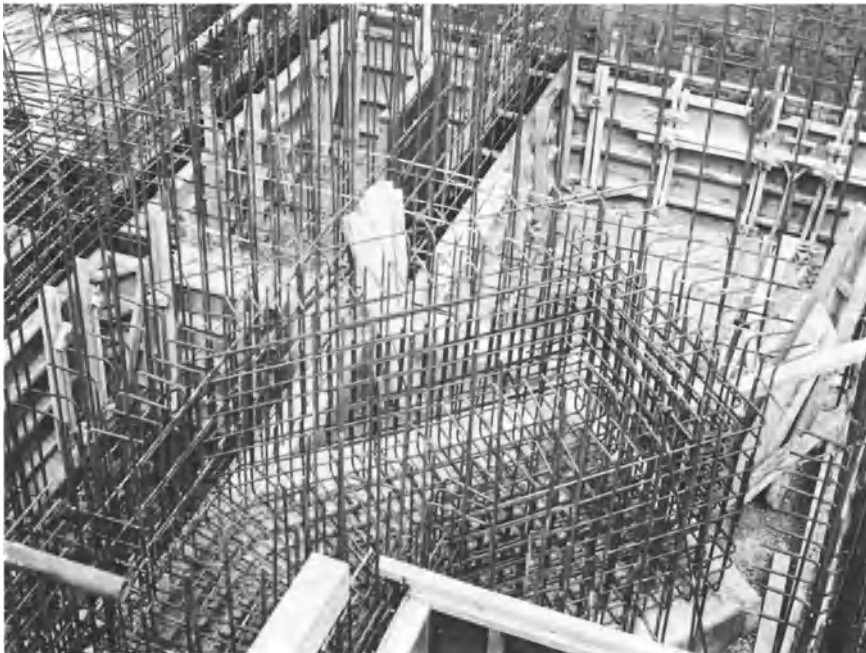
Reinforcement must be accurately dimensioned and bent, and laps must be provided that permit the steelfixer to make adjustments for unavoidable discrepancies in the concrete work
